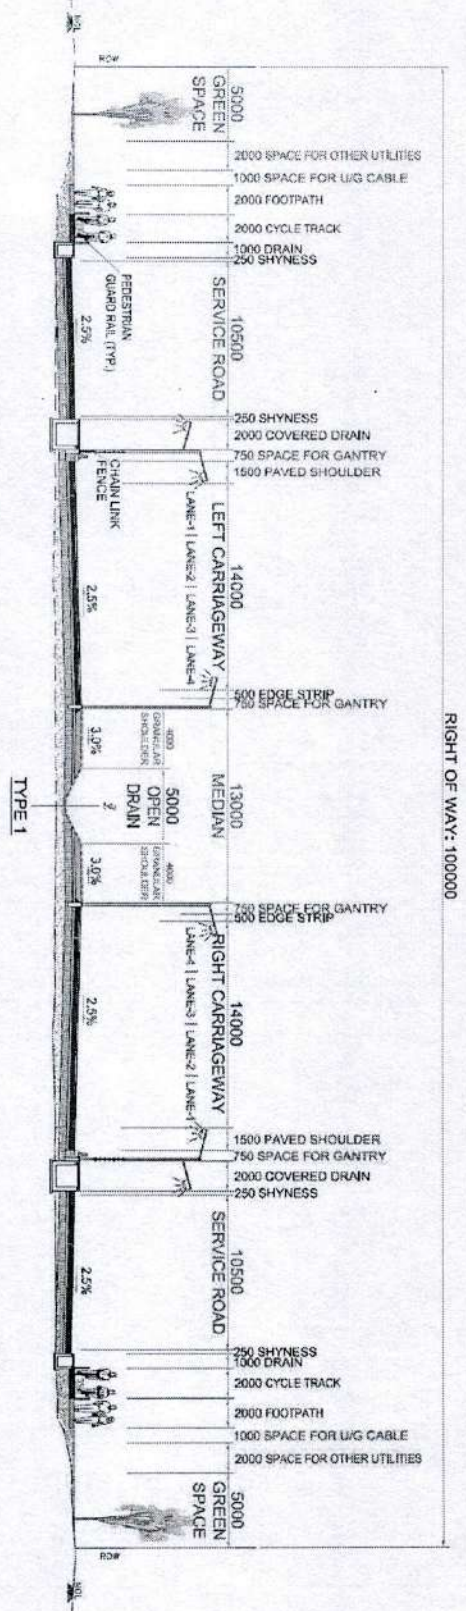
Typical cross section (at grade) of the proposed PRR showing various elements
